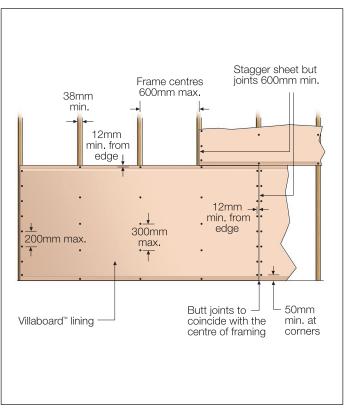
TILED FASTENING TO WALL FRAMES
